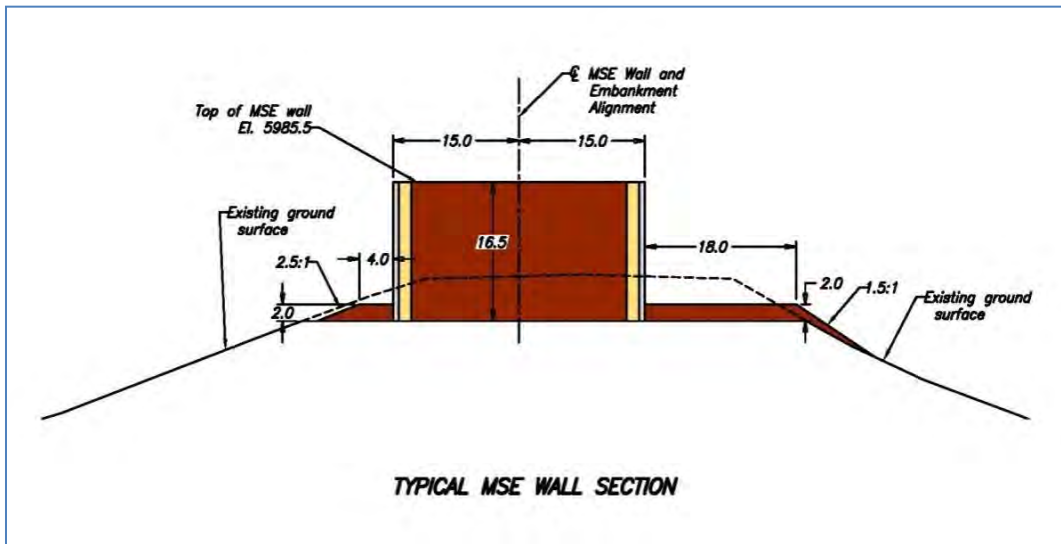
Preferred Alternative, MSE wall – section view.
